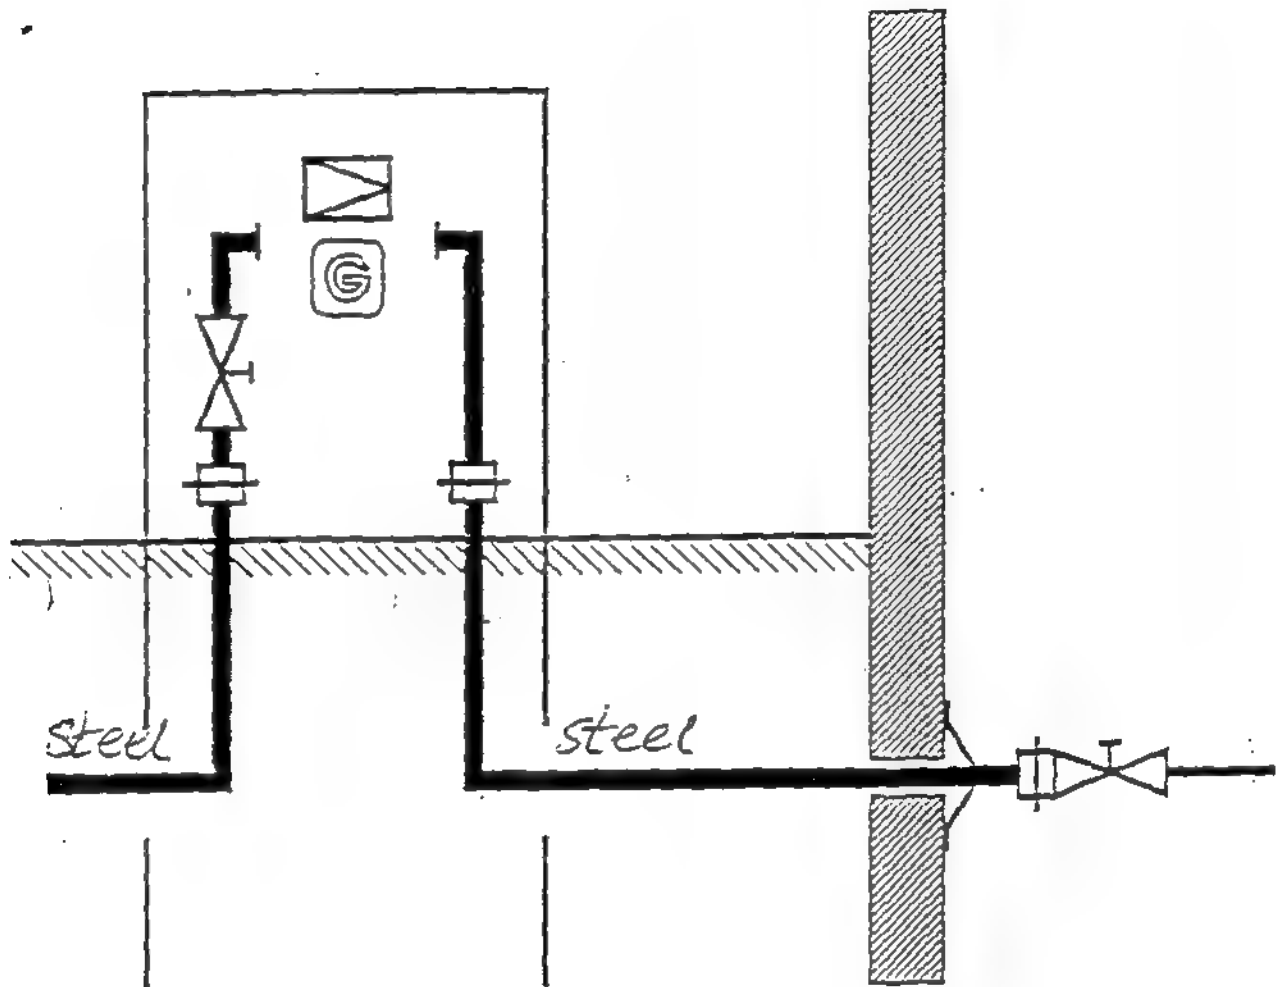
Insulating joints in detached control box and/or meter case made of metal or concrete (foundation made of reinforced concrete) - house-connection line made of PE - transition to steel before inlet into the box (case)
